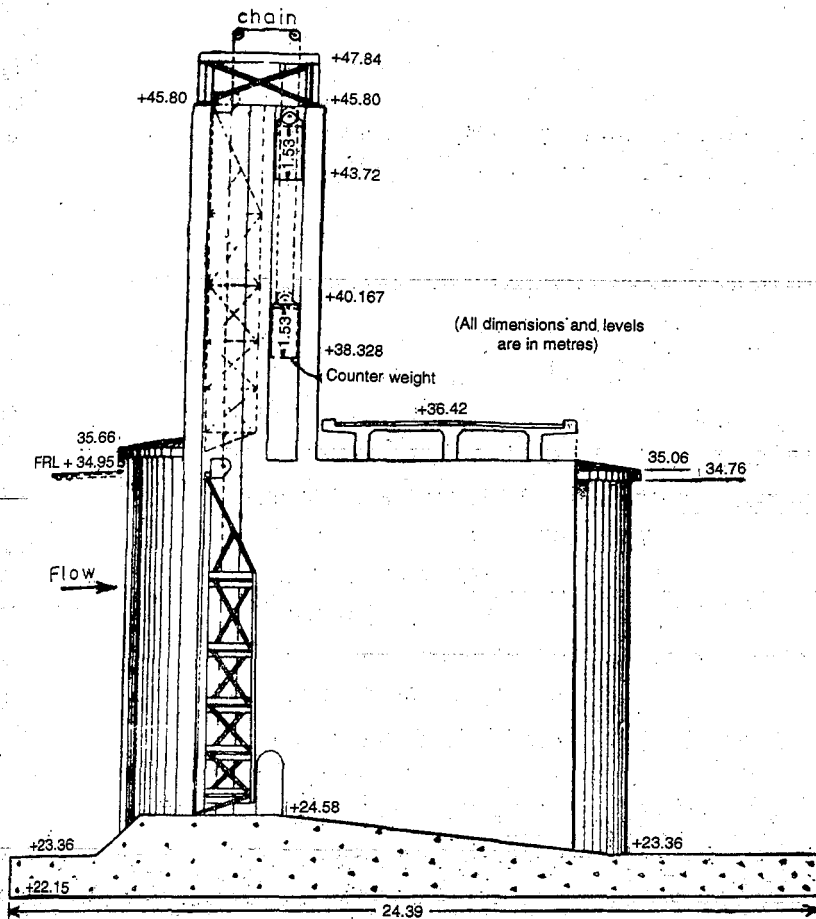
(e) Cross-section of Spillway Gate at Ottakkal weir.
